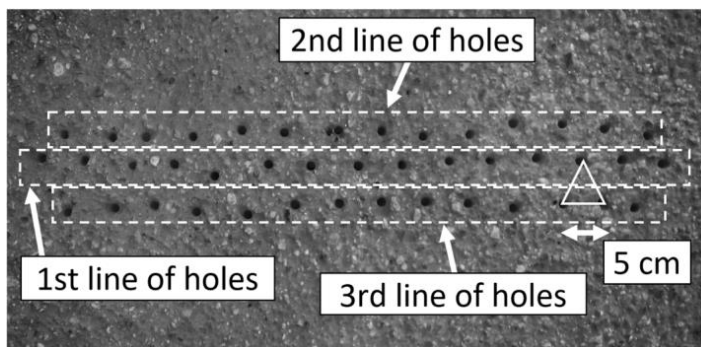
Detail of the three lines of holes drilled in the road pavement under test.
